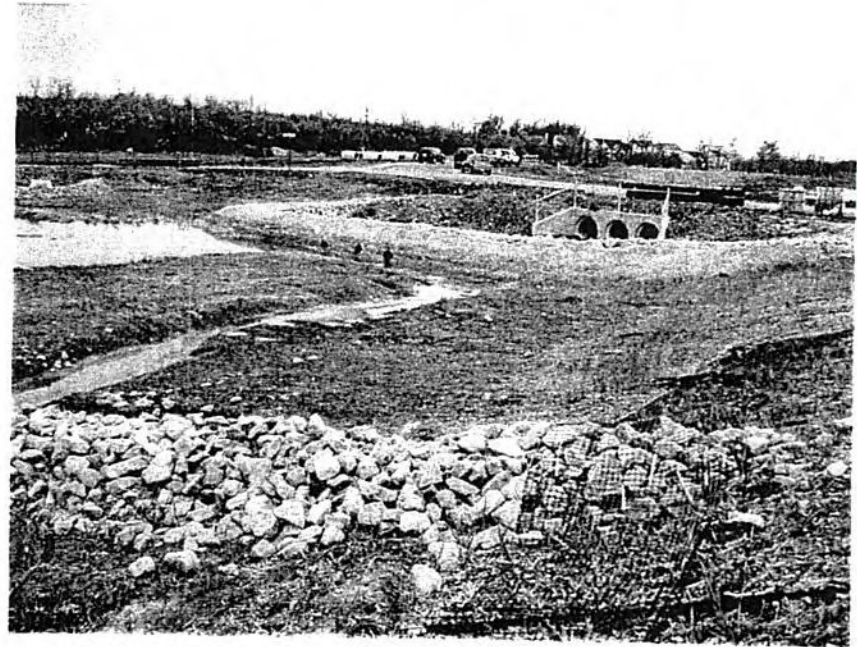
Another view away from photo #9 showing western portion of pre-existing wetland area towards lower lake on west side of site.
